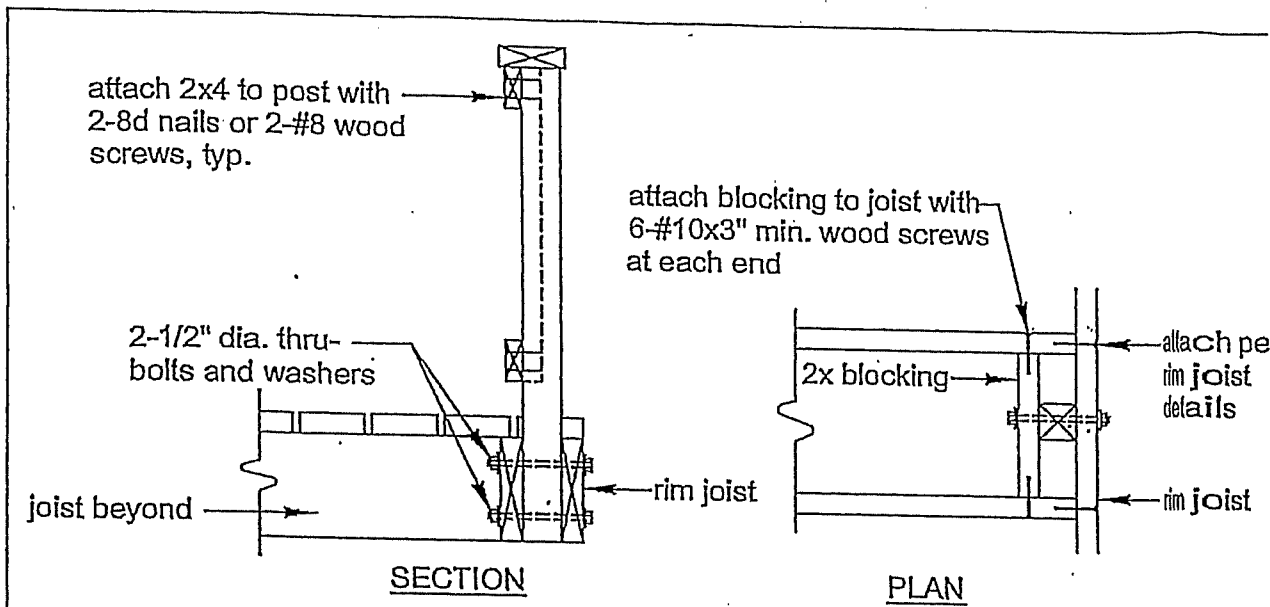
GUARD POST TO RIM JOIST DETAIL, OPTION 1
